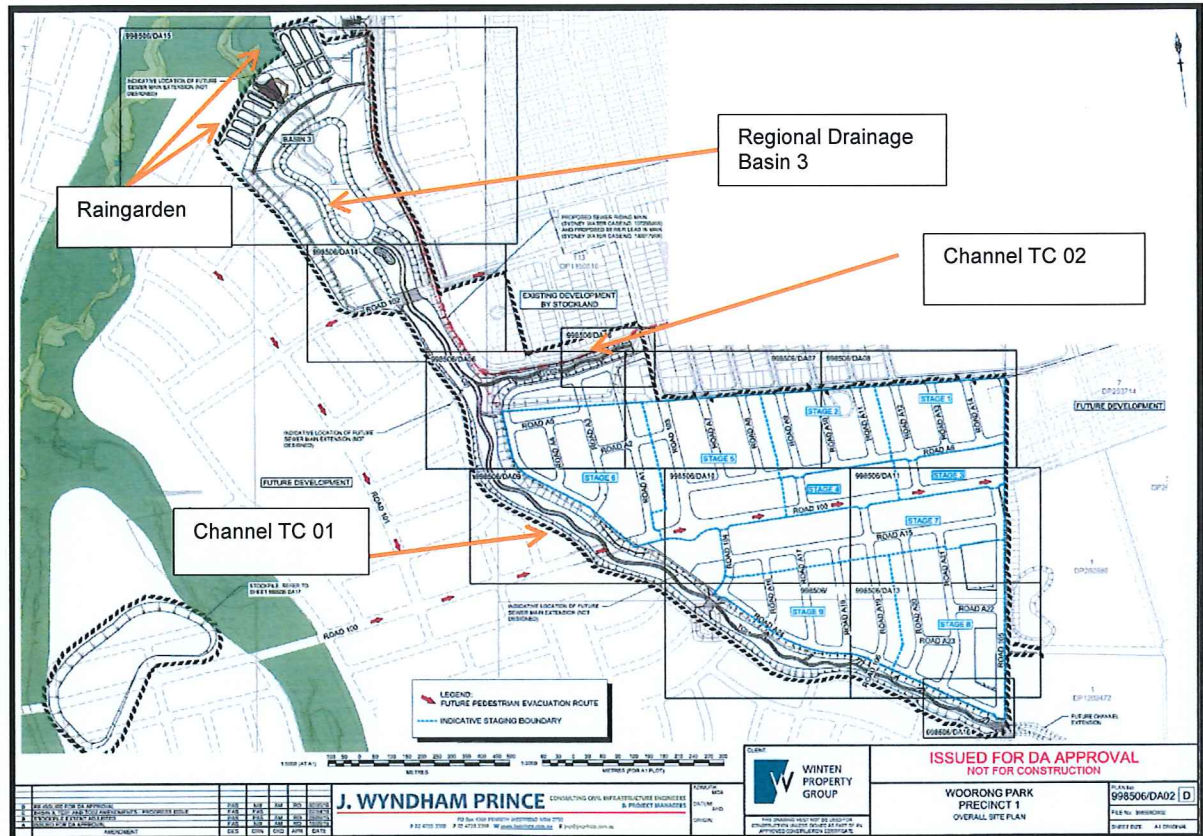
Plan showing context to drainage system and surrounding land (Source: J Wyndham Prince)
